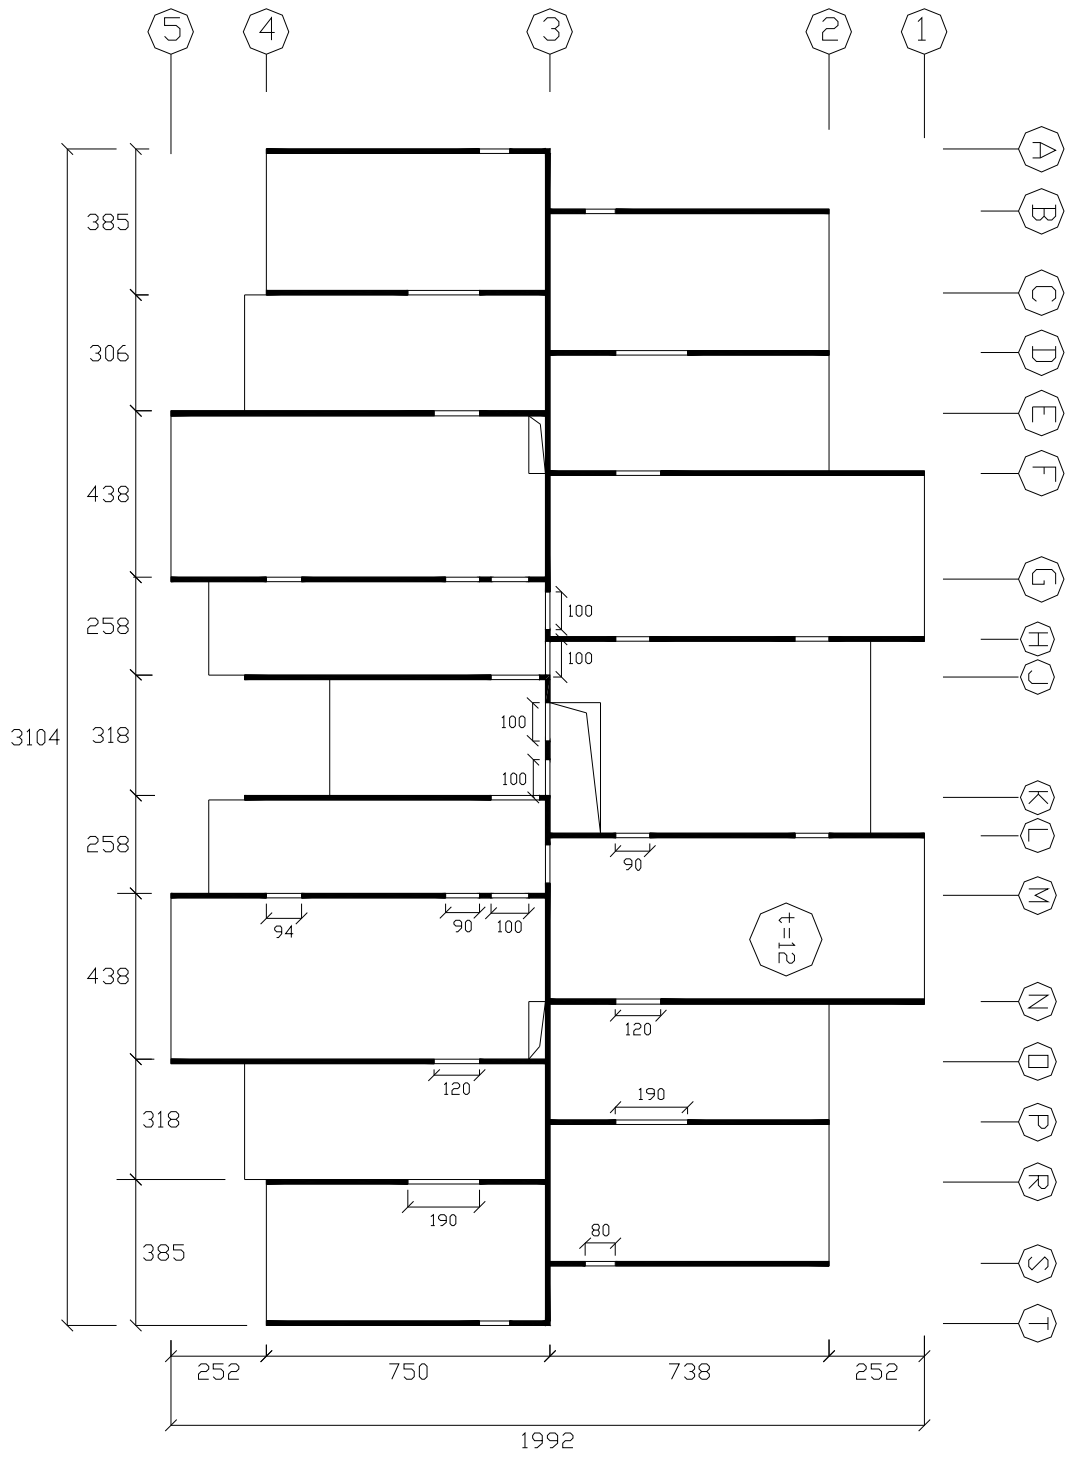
Typical plan view – Plan No. 2 (units in cm)
